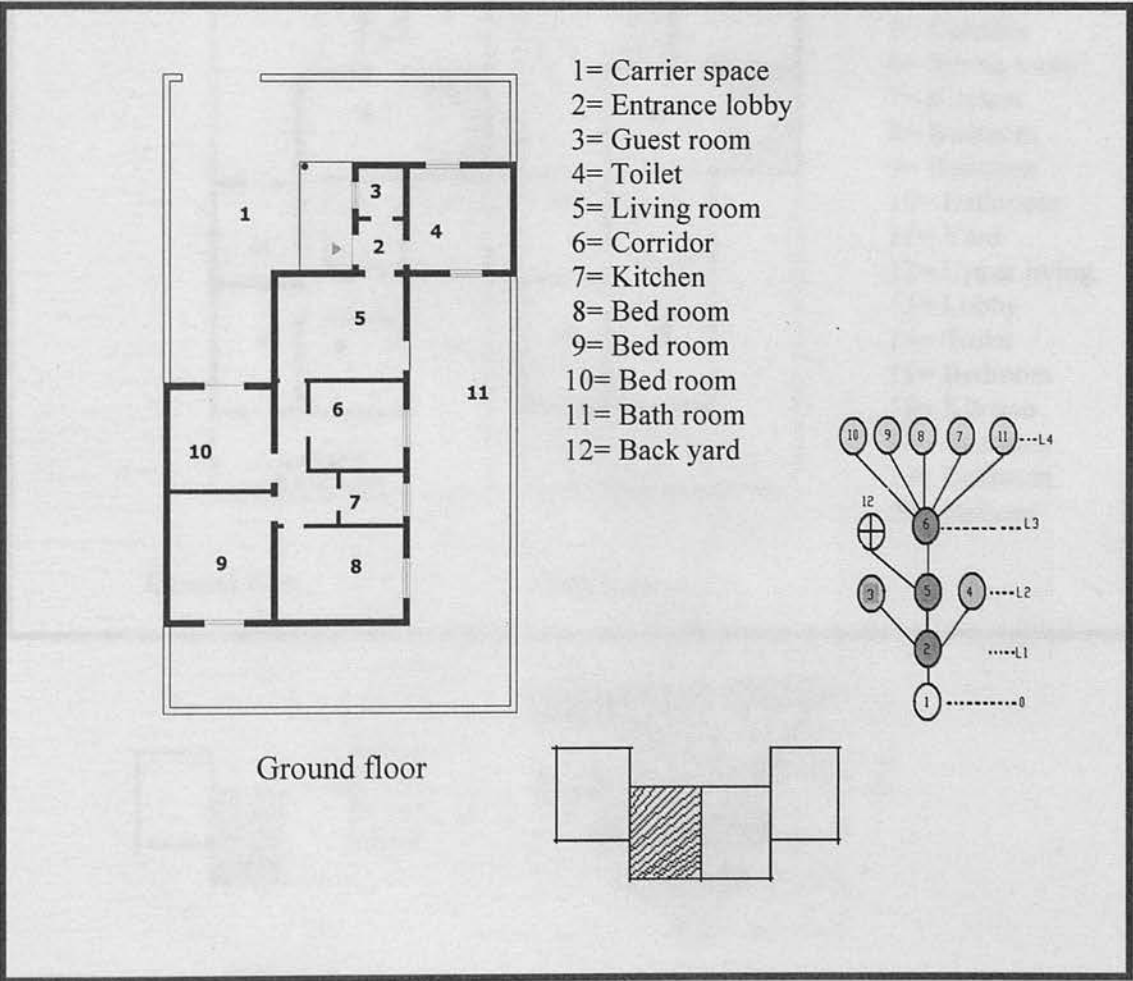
10 Dwelling type B, the original plan. (Source: the author)
